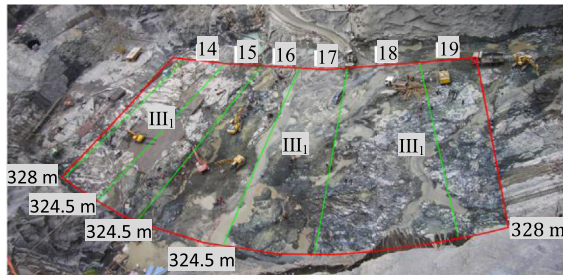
Overall view of riverbed foundation surface after global enlargement of excavation of riverbed dam foundation (1:1000). The numbers 14–19 are the sections.
